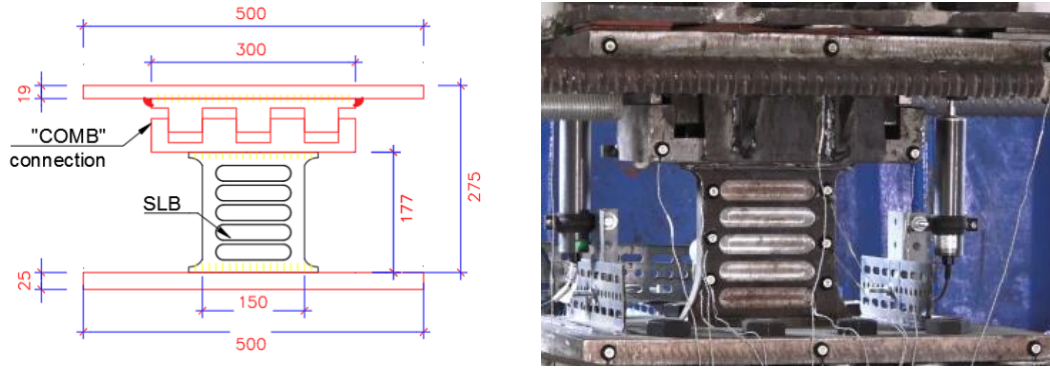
Dimensions in mm (left) and SLB connection type 2 (right)
